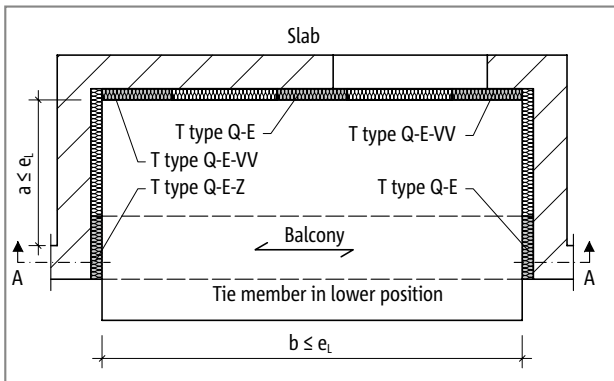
Schöck Isokorb® T type Q-E-Z, Q-E: Layout of recessed balcony
